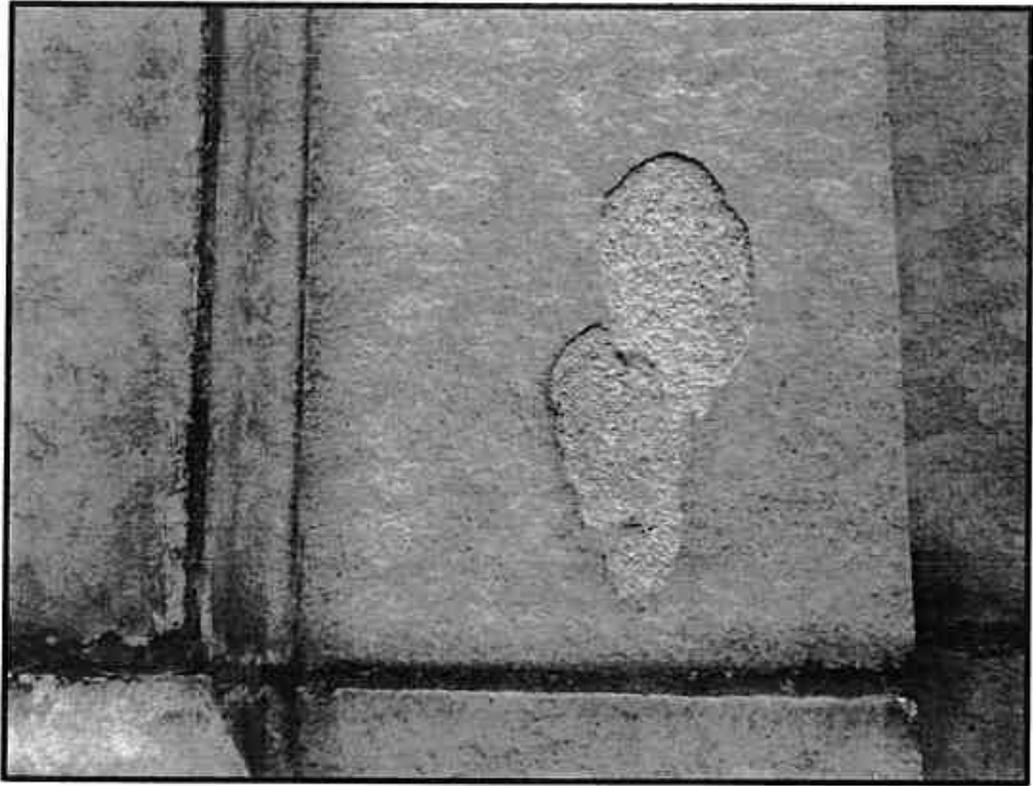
Close-up of spalling, and soil build-up on right bay pilaster. Note the large chip in granite plinth block.
